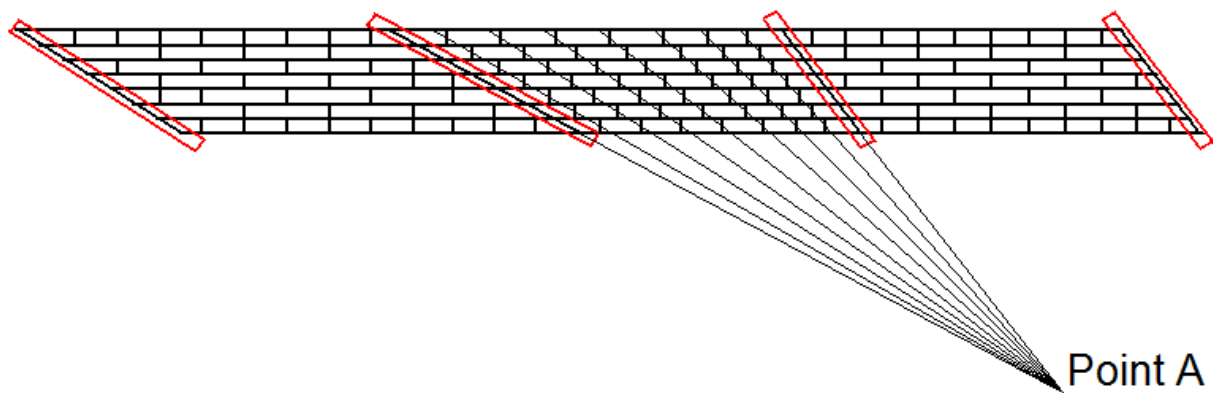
Additional alternative framing arrangement for bridge EISSS2.
